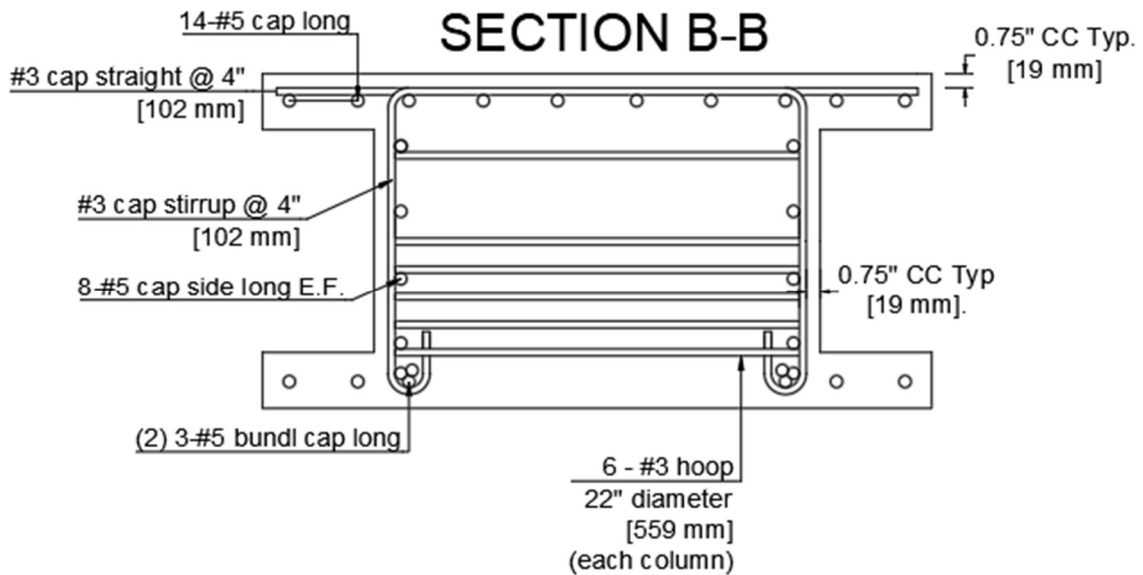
Cap beam cross section B-B, pocket and hoops
